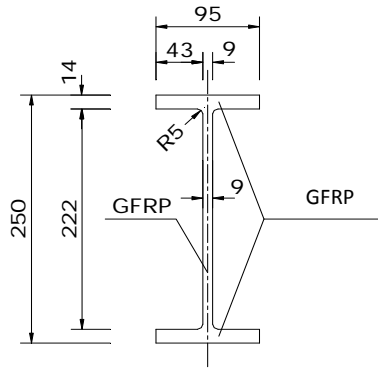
Cross-sectional dimensions of GFRP I-beam (Units: mm)
